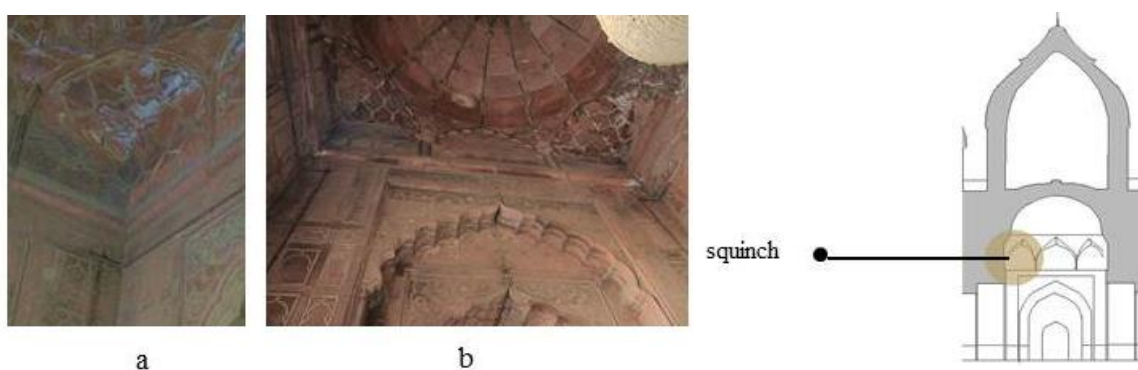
Transversal section, ref of measure drawing (Author-2012)
